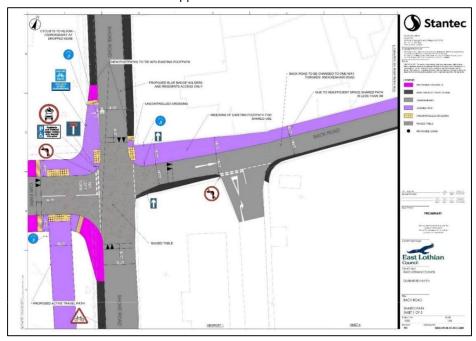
Proposed Car Park Access/Shore Road/Back Road improvements.
